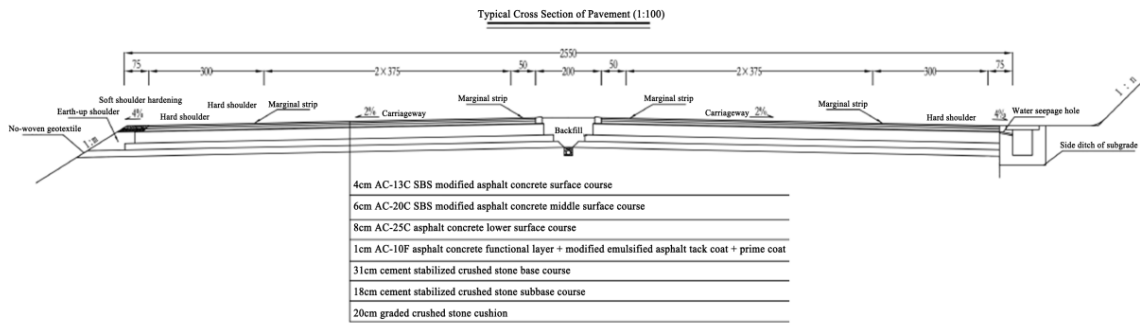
Cross-section of Pavement Structure of Shuolong Connecting Line of the Project
